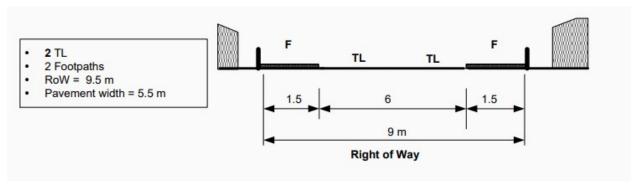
5 Typical Cross-section for Class B Roads (with RoW 9 m)
